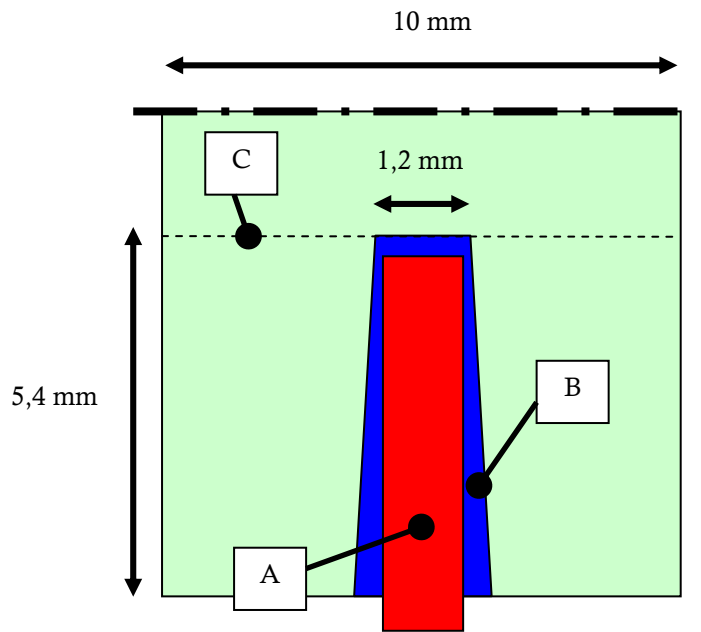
, Close-up of cross-section of bottom of girder, not to scale. Possible failure mechanisms of the reinforcement connection, indicated by A, B and C:
